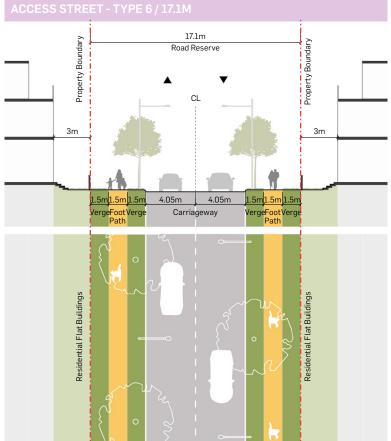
Indicative Street Section E-E' - Access Street - Type 6
